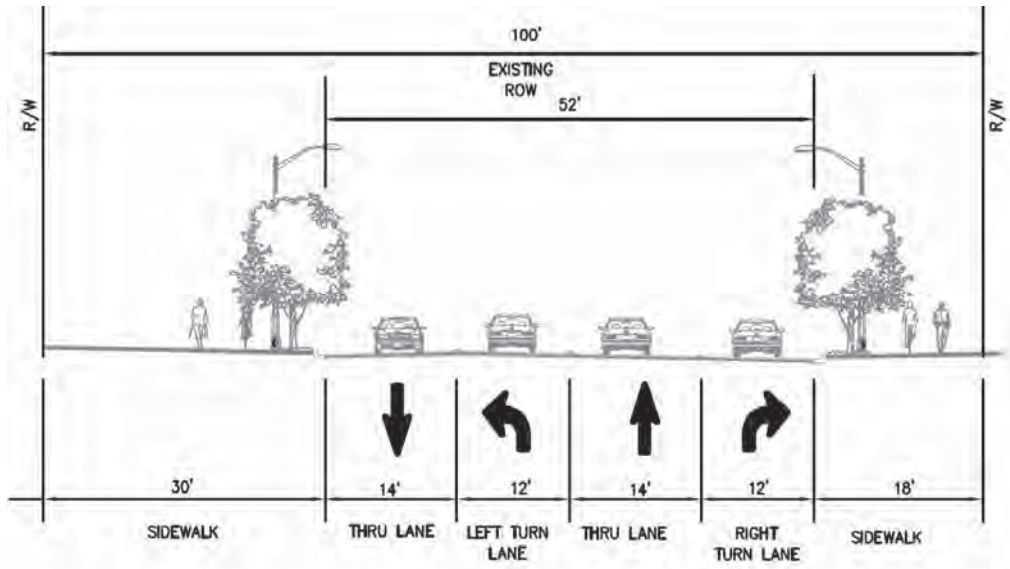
Proposed Cross Section, 3rd Avenue At Signalized Intersections
